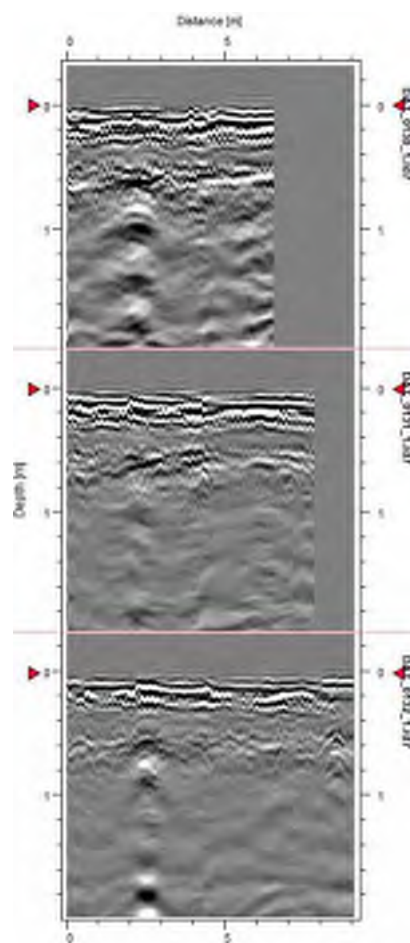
Three GPR profiles showing steel reinforcing and pavement layers.
